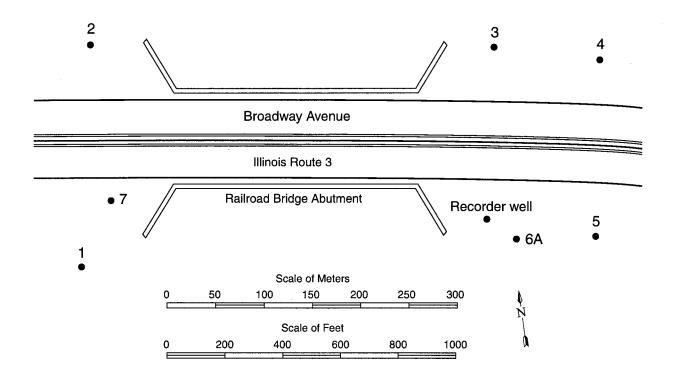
Locations of dewatering wells at the Venice Subway (Illinois Route 3)
